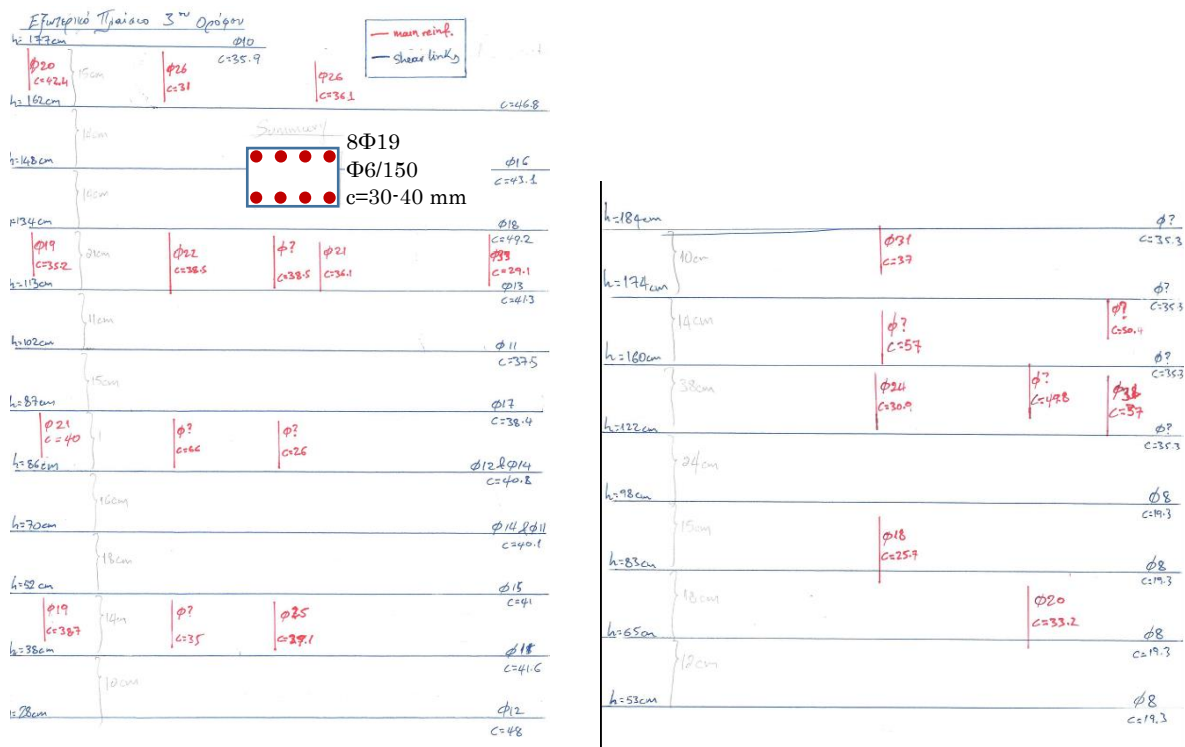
Reinforcement measurements on 3rd floor columns; external frame (left) and internal frame (right)
